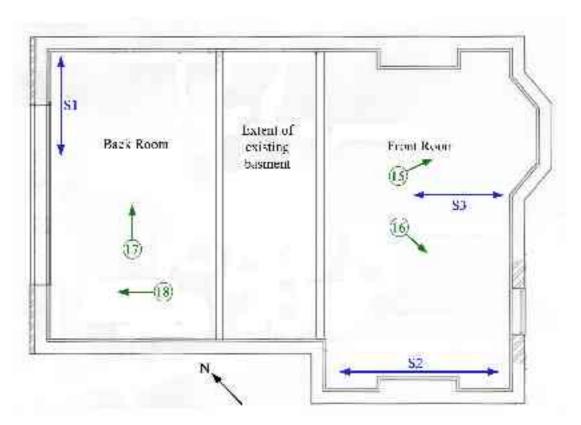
A plan of the site showing the front and back room excavation areas with the location of sections 1-3 and photographs in Figures 15-18.
